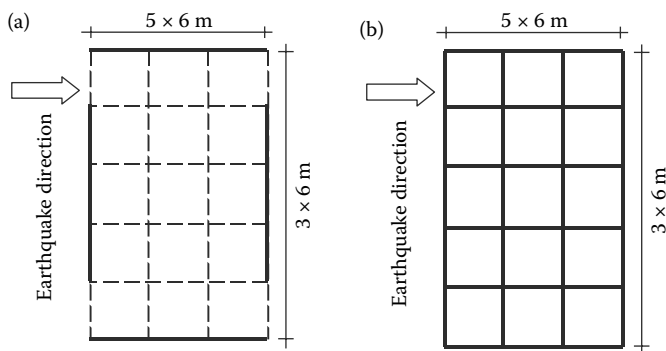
Plan layouts of the case studies: (a) perimetral MRF (P); (b) space MRF (S).
